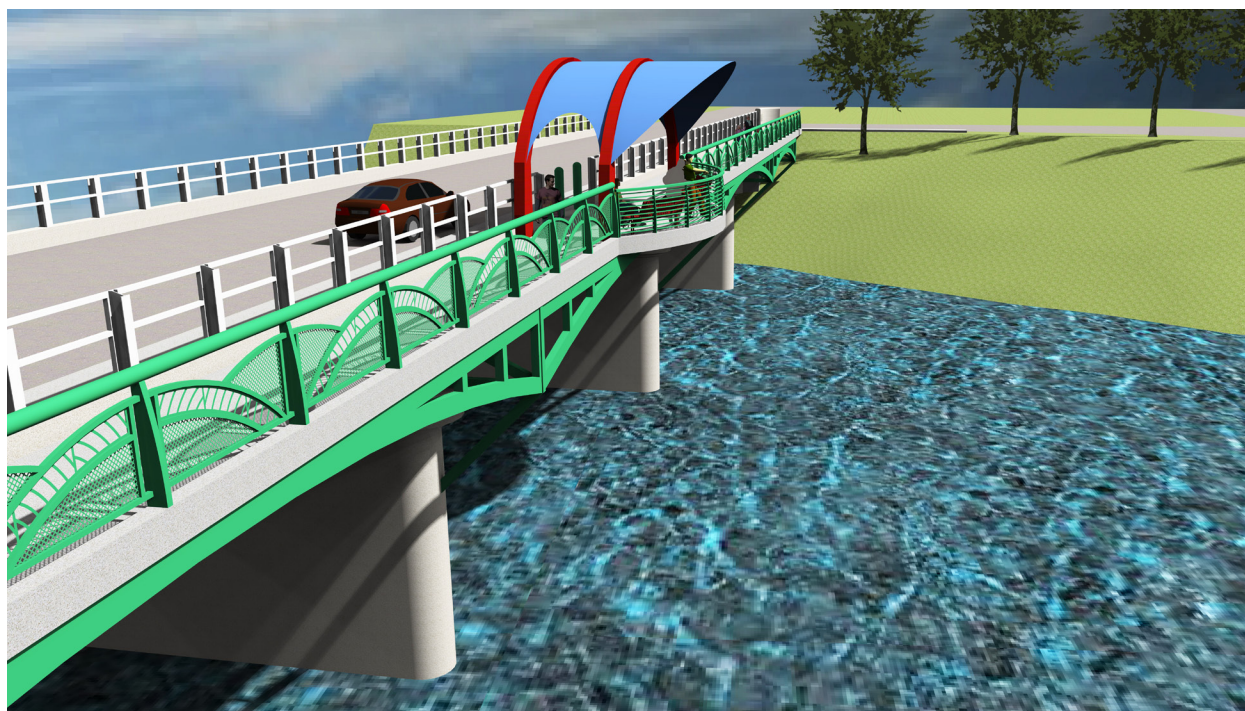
Conceptual rendering of the Washington Street bridge from Project 33. Bridge Improvements.
